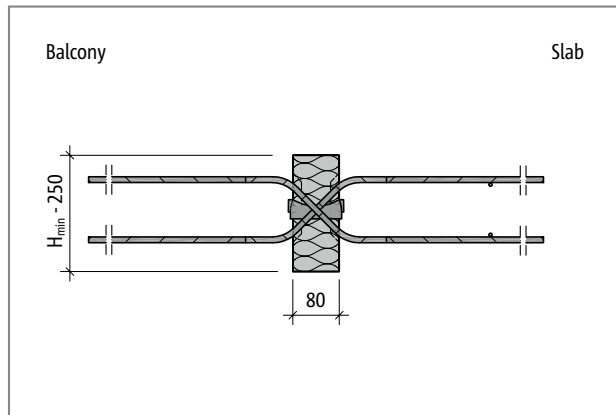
Schöck Isokorb® T type Q-E-VV5: Product section
